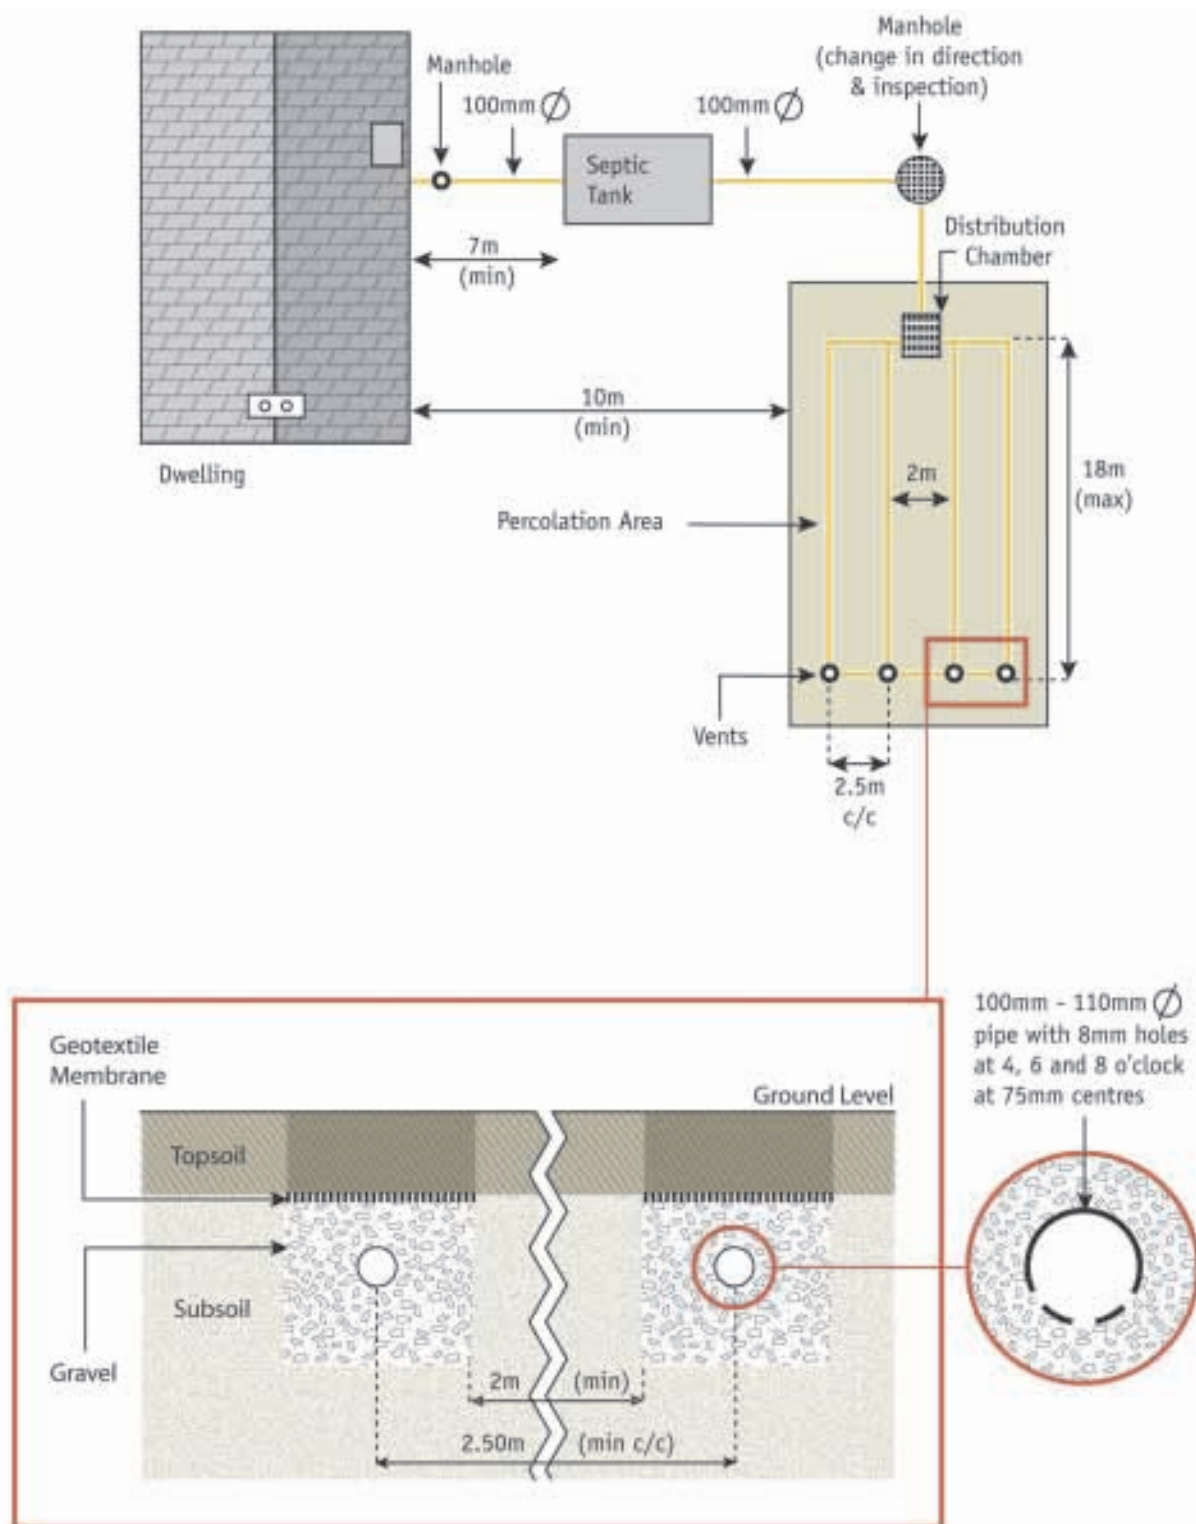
PLAN AND SECTION OF LAYOUT OF SEPTIC TANK SYSTEM.
